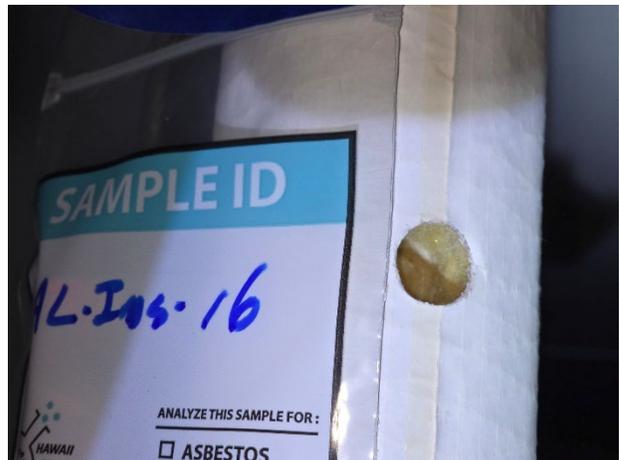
Sample ID: MAL-Ins-16 White wrap and yellow insulation. Above Drop Ceiling. Bathroom.
